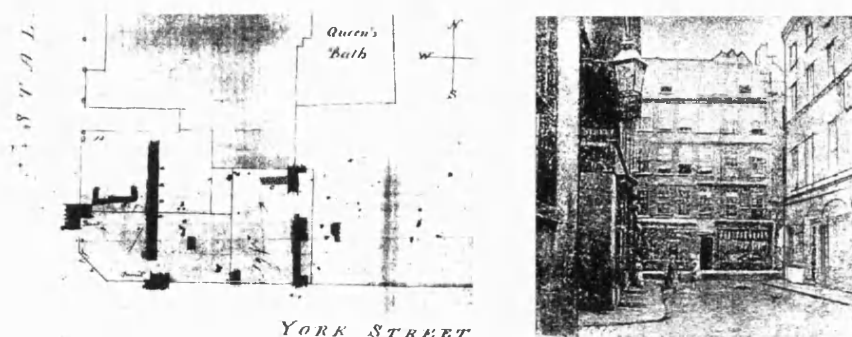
left. A faded plan showing three plot divisions of the corner site; Manners's reference to houses, in the plural, indicates at least two, but from the plan possibly three.
